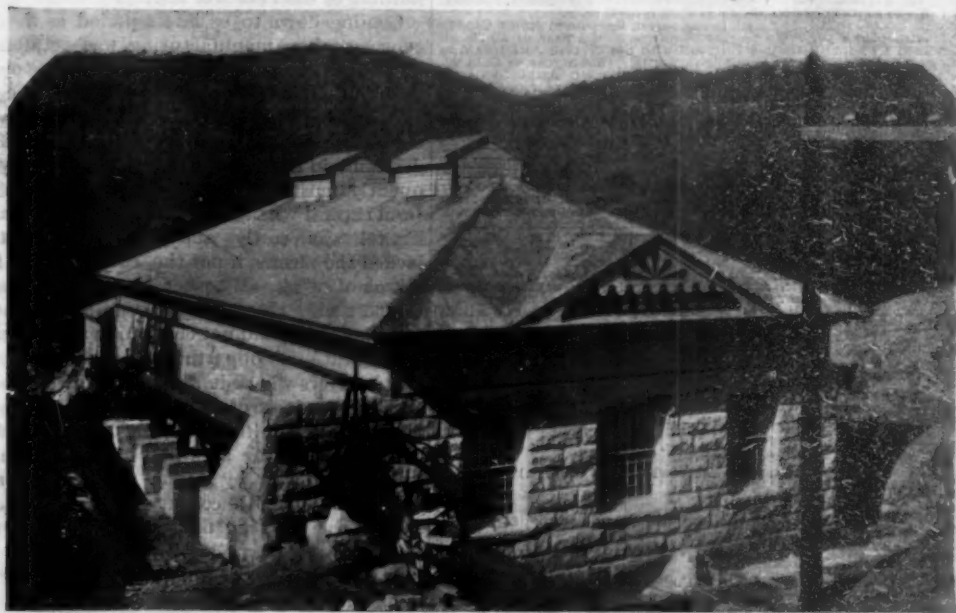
POWER HOUSE, FOOT OF PIPE LINE, SHOWING RECEIVER ABOVE WHEEL PIT.
